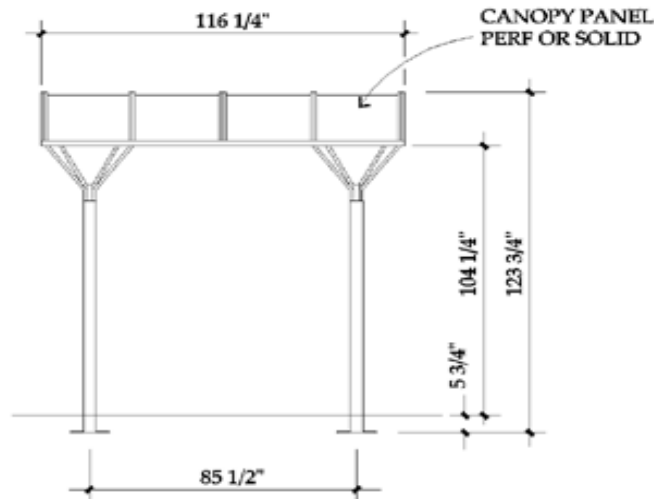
Kaleidoscope Centered Canopy Front Elevation.
